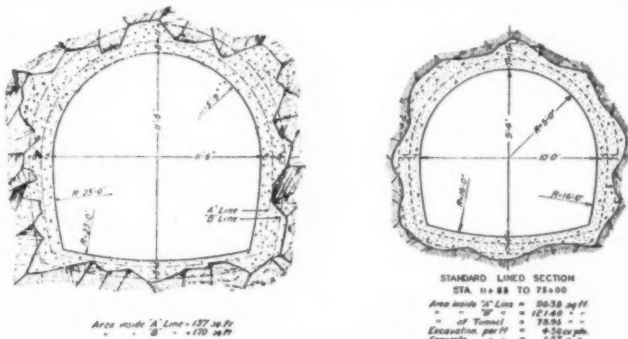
SECTIONS OF DIVERSION AND OUTLET TUNNELS
